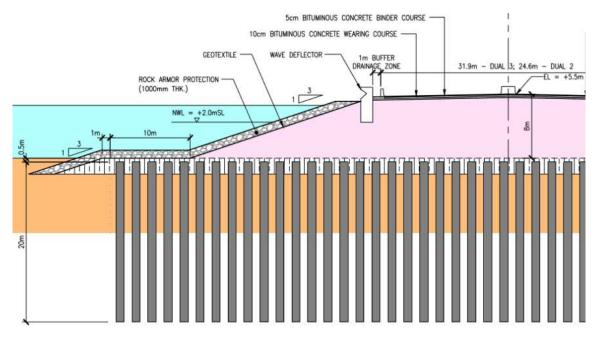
Typical Embankment Foundation Detail with Stone Column ground treatment
